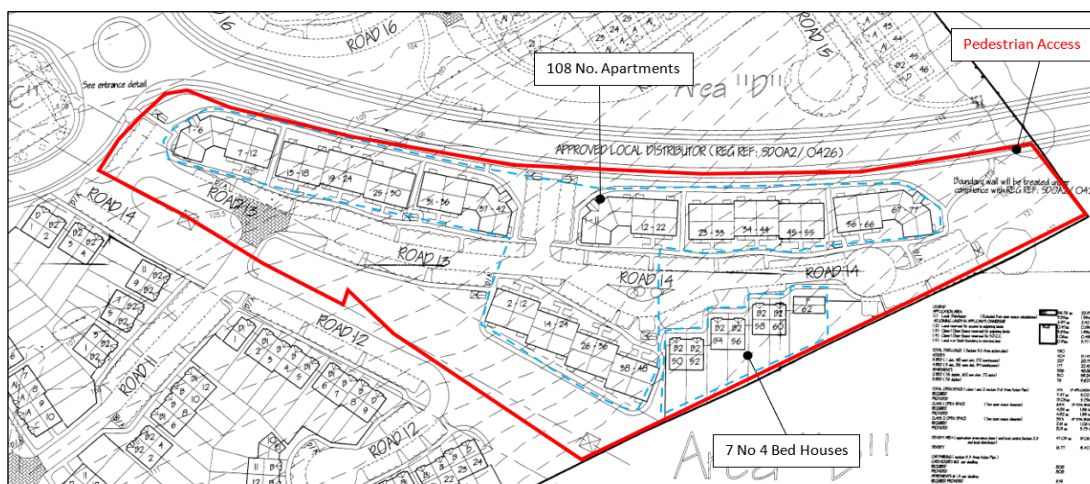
Approved Masterplan Layout Plan - SDCC Ref. SD04A/0393; ABP Ref. PL06S.212191.
